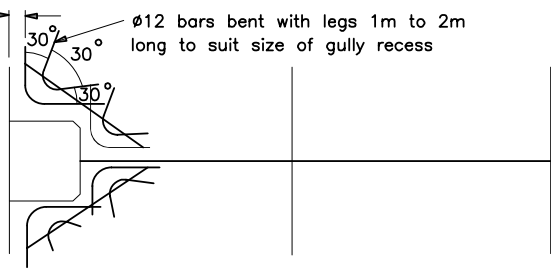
JOINT WITHIN GULLY DIMENSION
